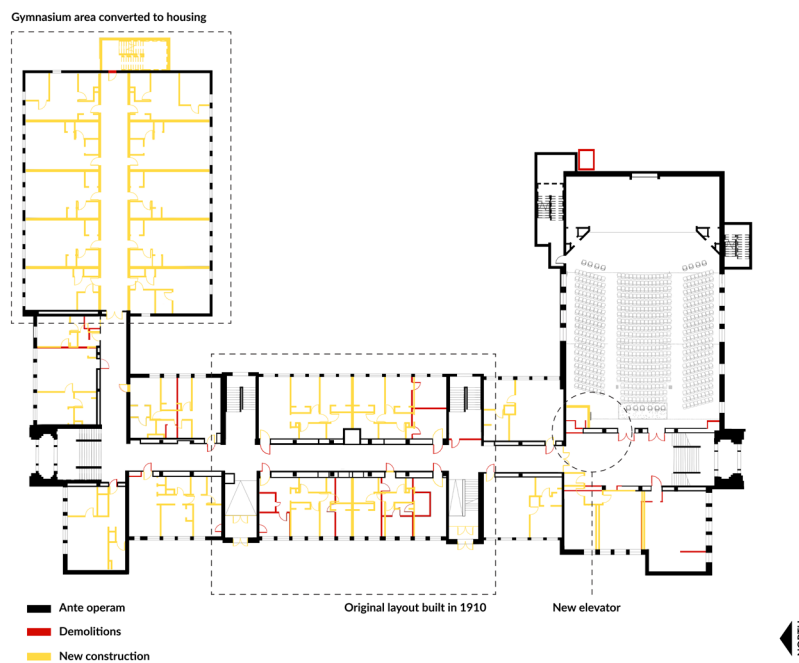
First floor plan of demolitions and new construction of Page Woodson Apartments. Source: Authors.
